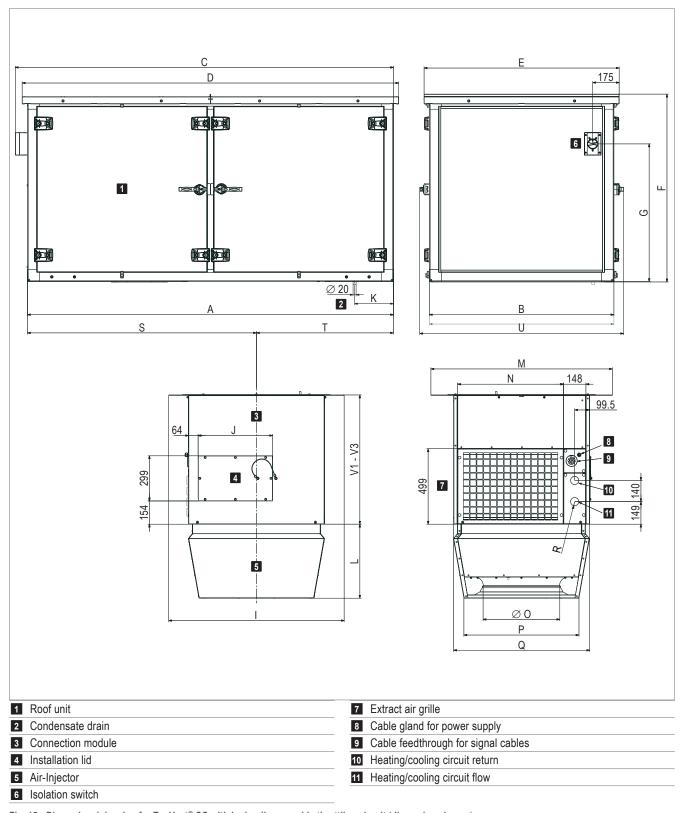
Dimensional drawing for TopVent® CC with hydraulic assembly throttling circuit (dimensions in mm)
